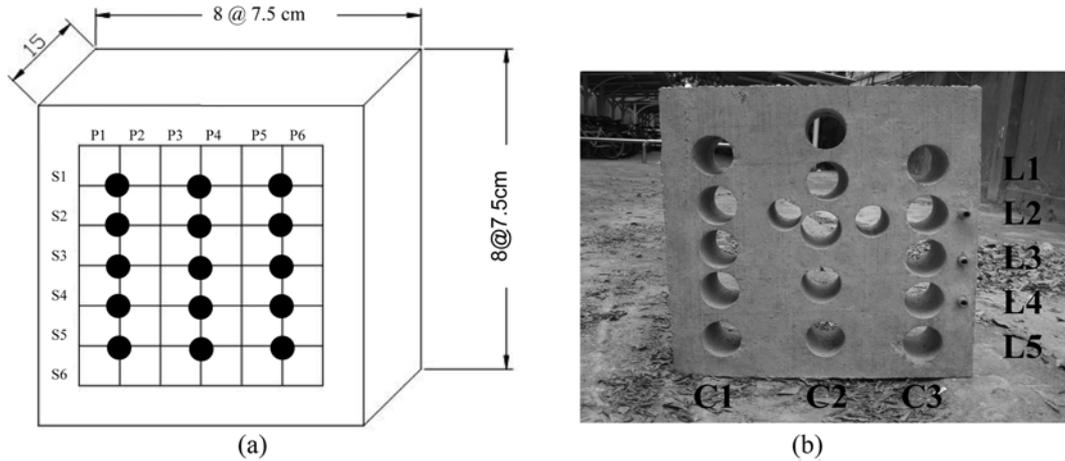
LWAC wall specimen: (a) 36 points for ultrasonic measurement, (b) position of cores drilled
